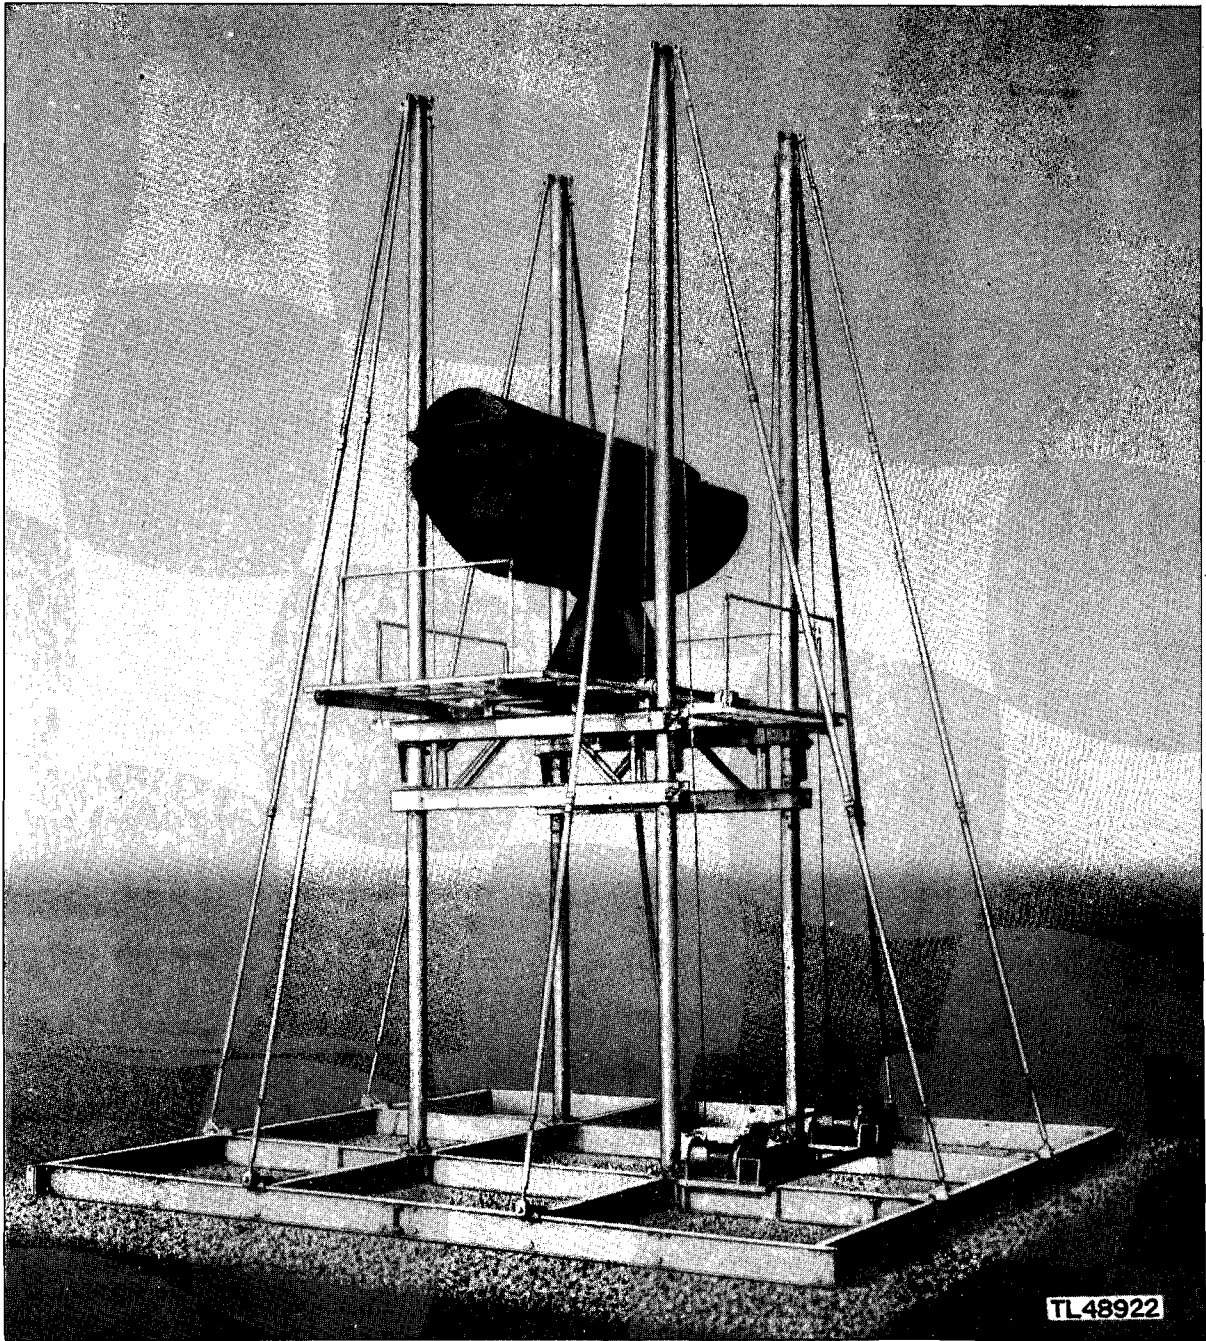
Installing horizontal braces and compression members, elevator raised.
